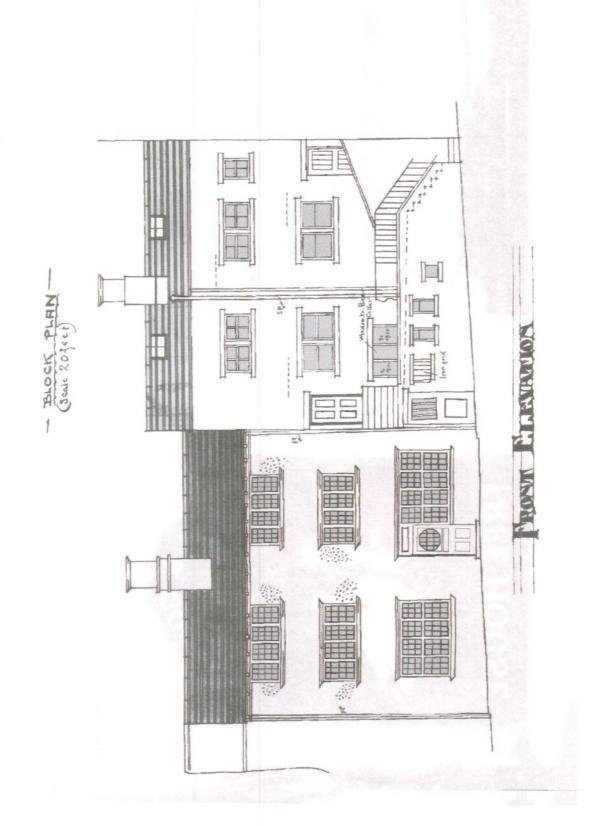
1902 remodelling. Walshes proposed plan of the front elevation after the re-modelling.
